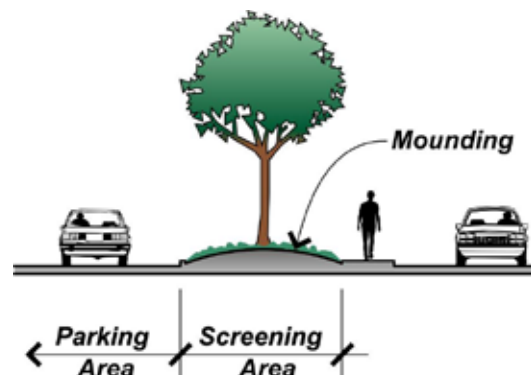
Typical method of separating and screening parking area from streets.
